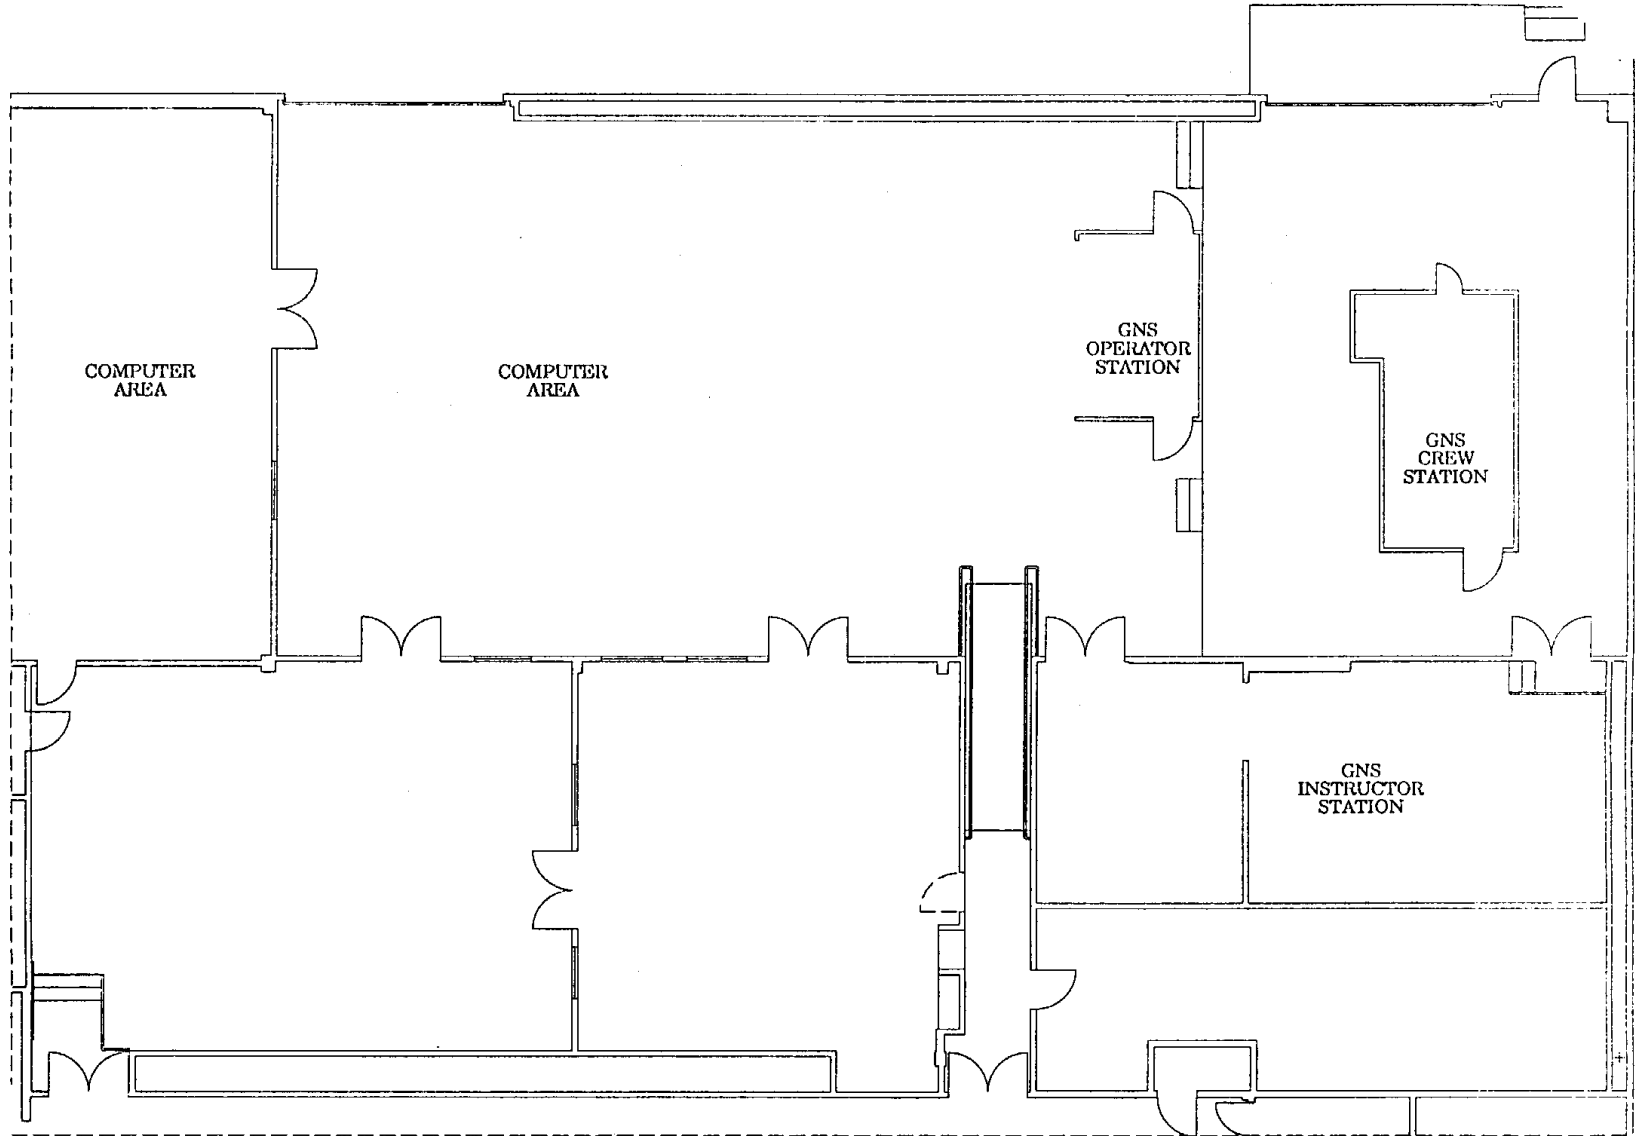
Map A - Building 5 Crew Training Facility, first floor
